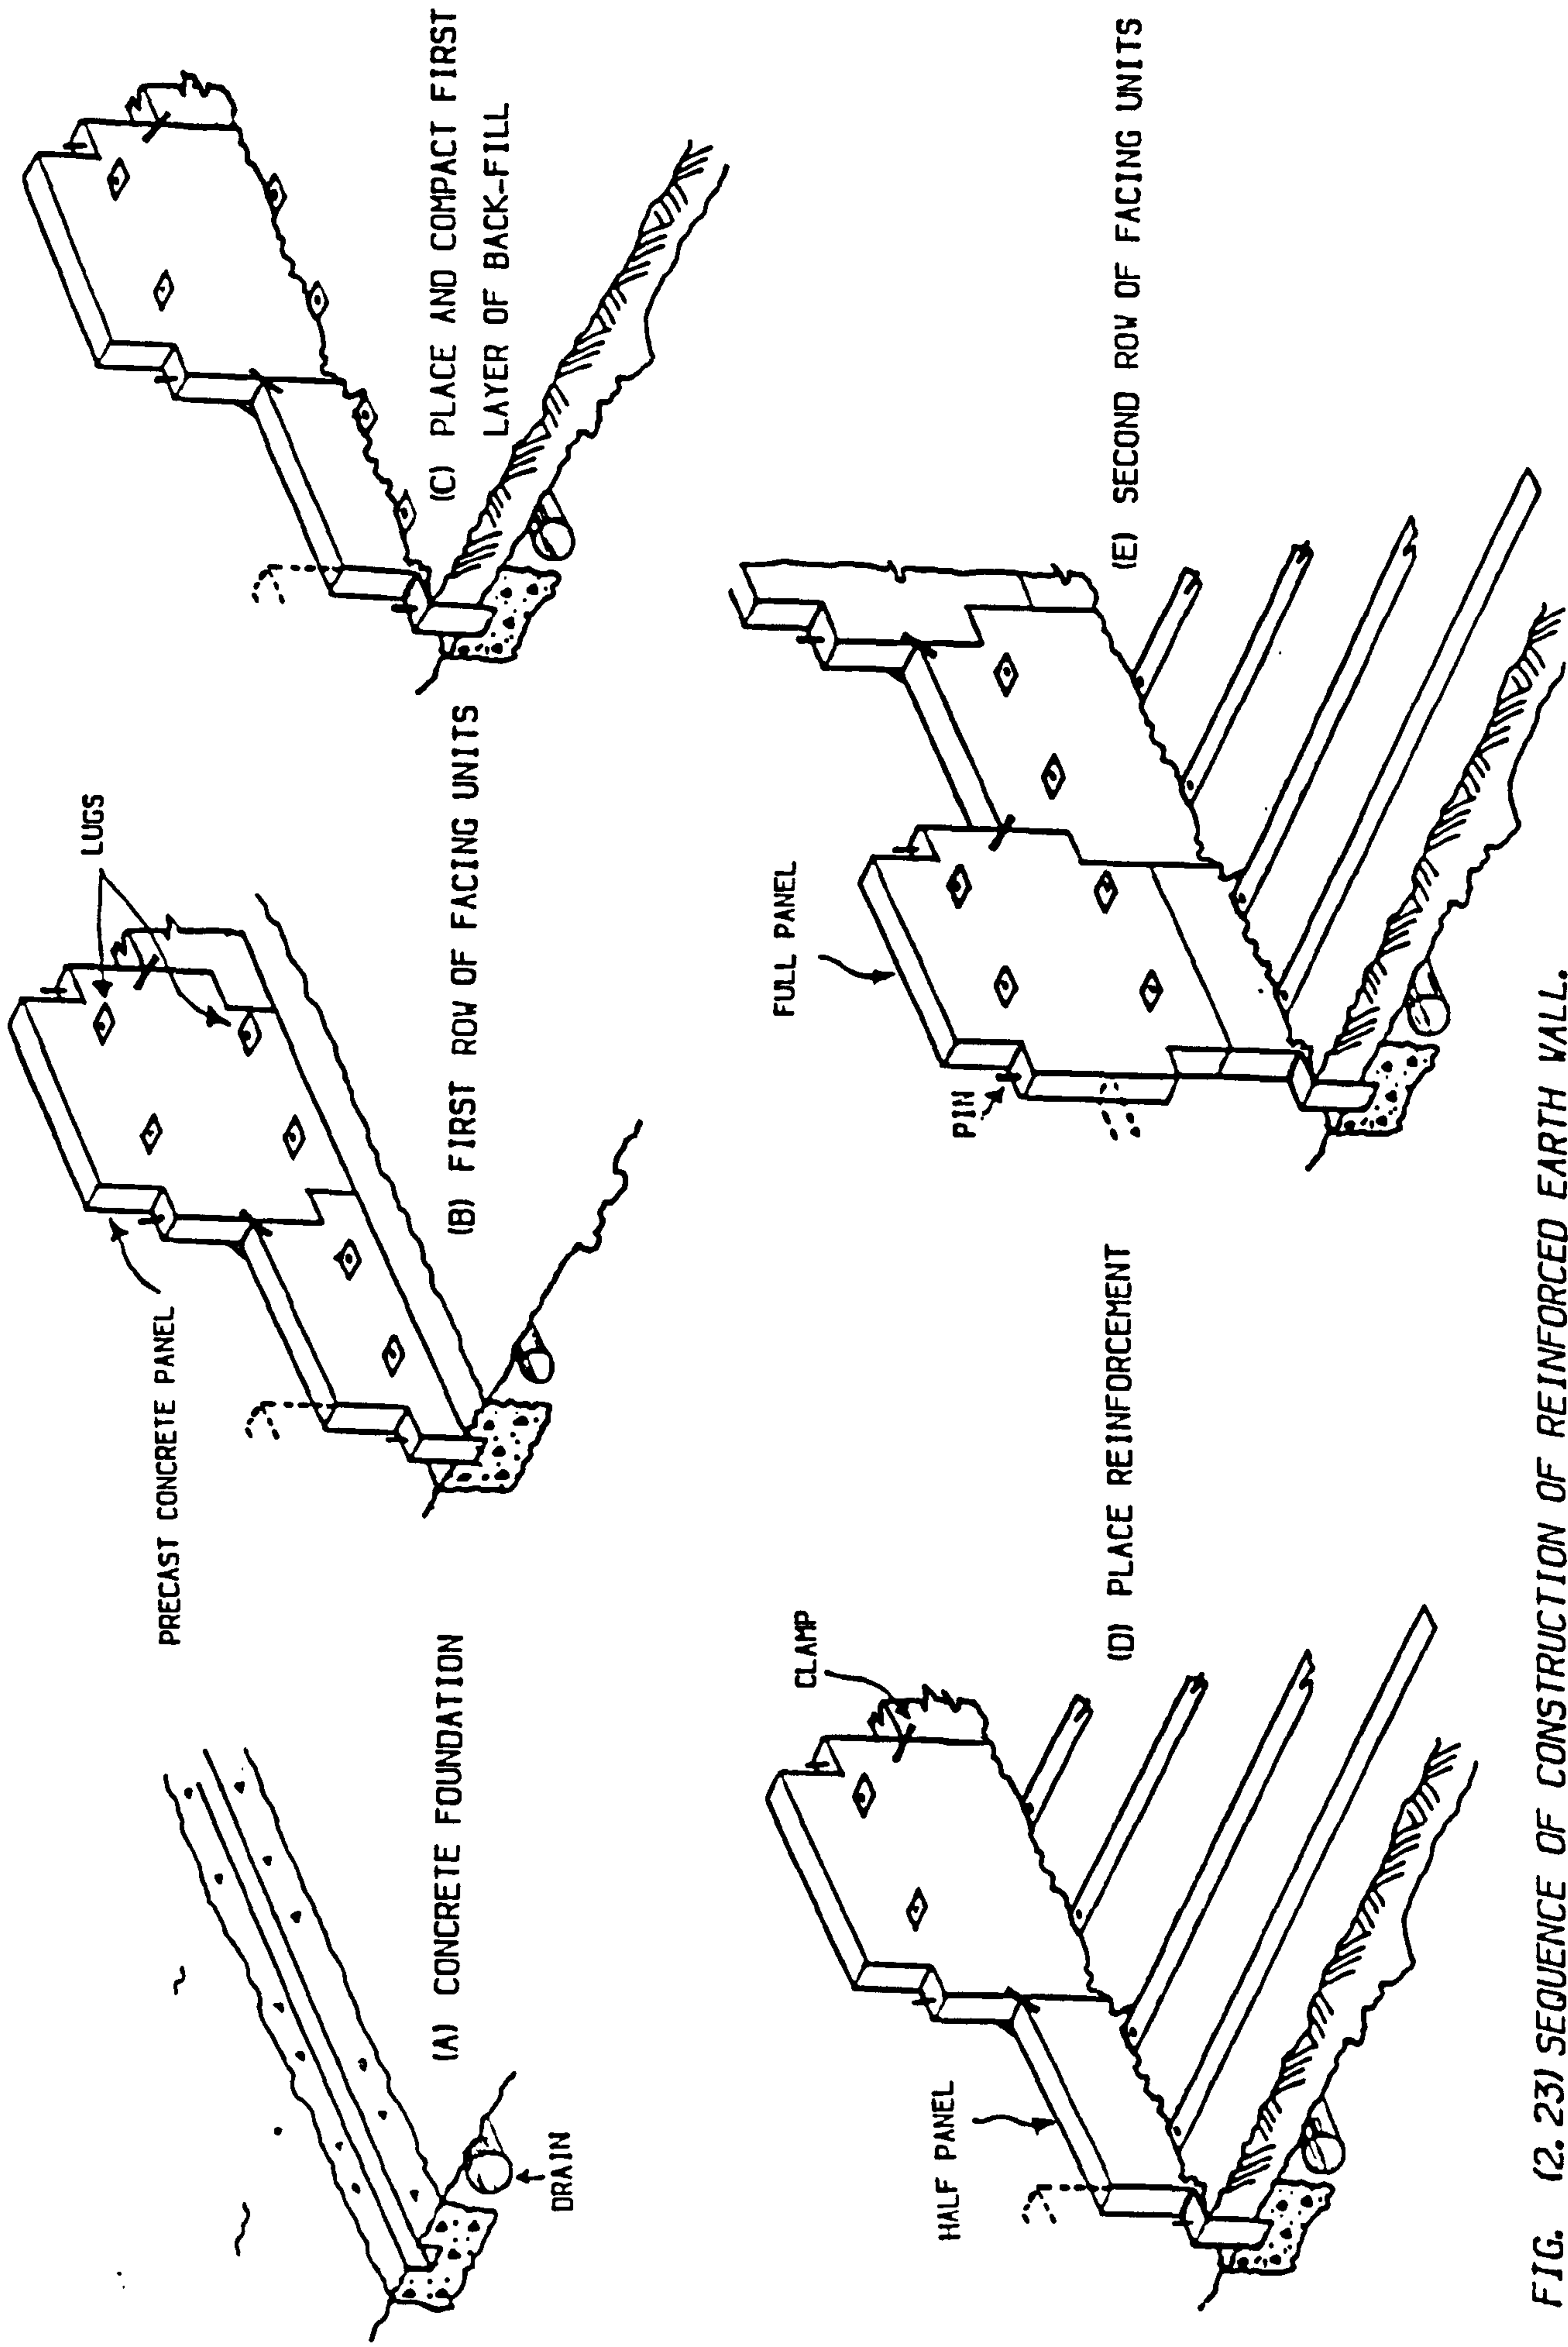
SEQUENCE OF CONSTRUCTION OF REINFORCED EARTH WALL.
